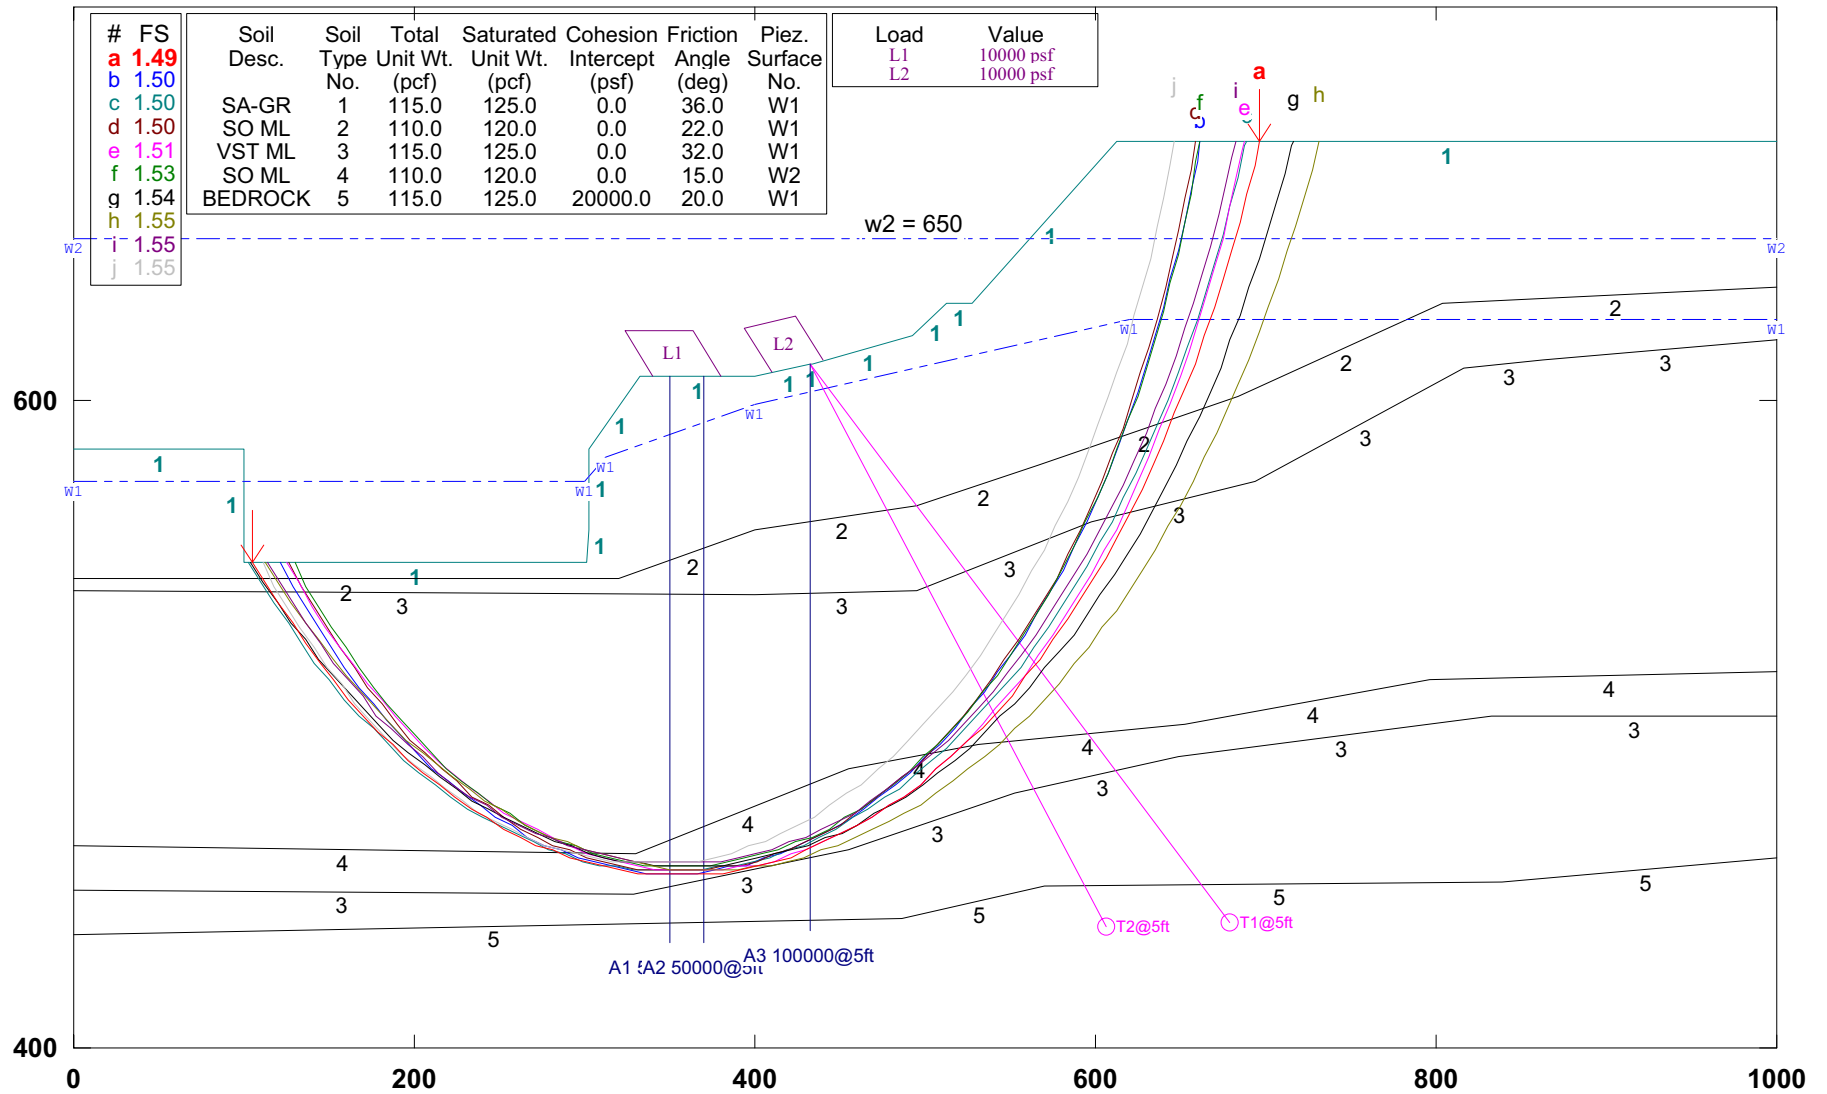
B.9: Stability of Existing Slope at Centerline of Existing Bridge (Section A-A).
